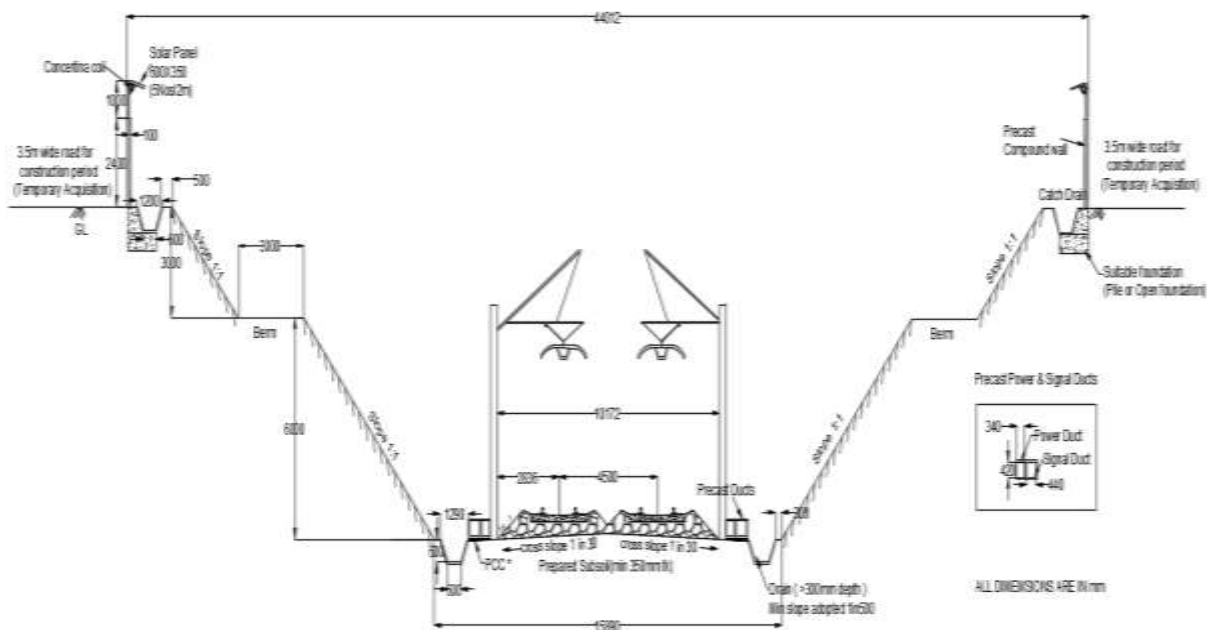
Typical arrangement without RCC retaining wall (0-9m)
